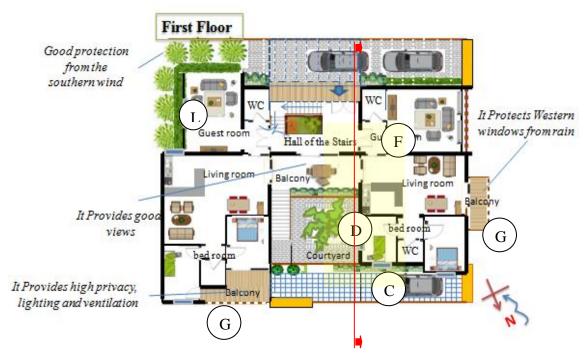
; this floor illustrated the solution of, Courtyard, hall of the stairs, balcony
